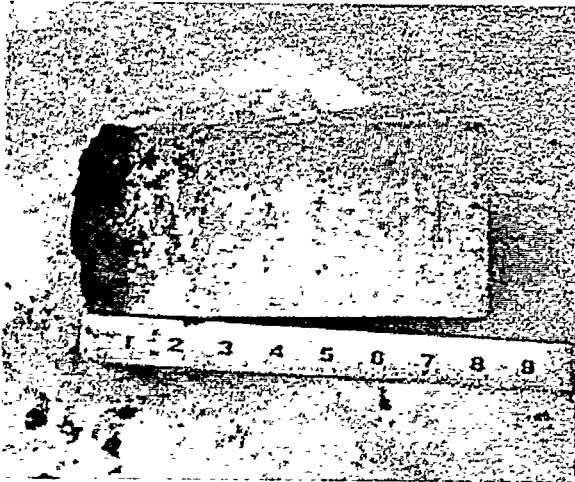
Concrete core from control room floor (location 74.SB006).
